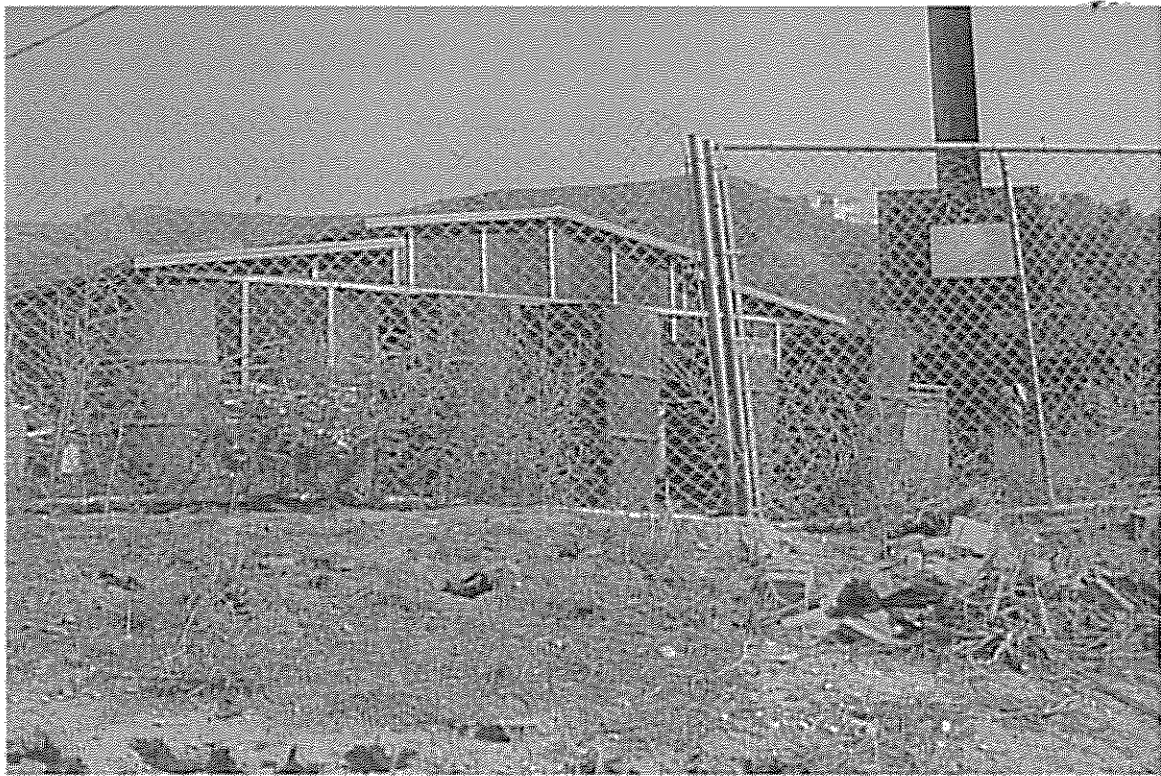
Fill Dirt and surveying markers, west of Alessandro Road via Flood Control access gate.
